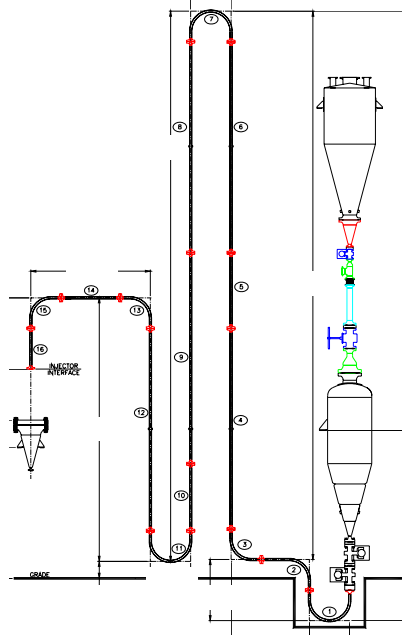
Primary 2-1/2"Sch.160 Feed Line (Drawing 7R109703)
